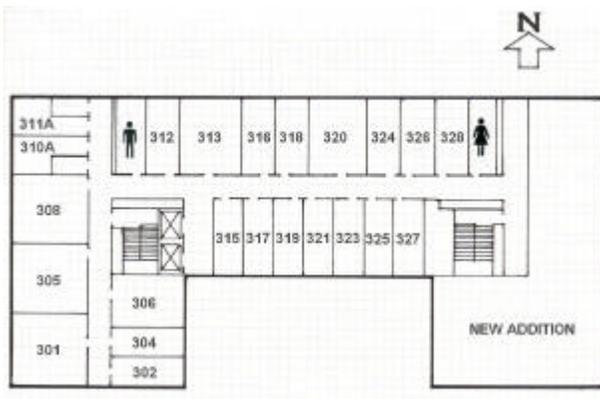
Typical office floor plan in case study building. There are approximately 268 offices on the 10 floors.
